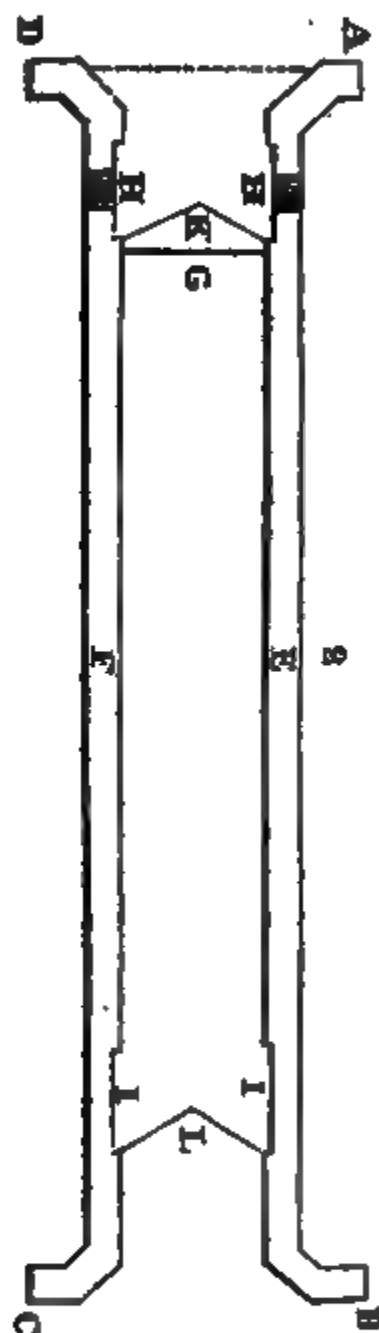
t, is a longitudinal section ; fig. 2d, a horizontal plan of a lock.
